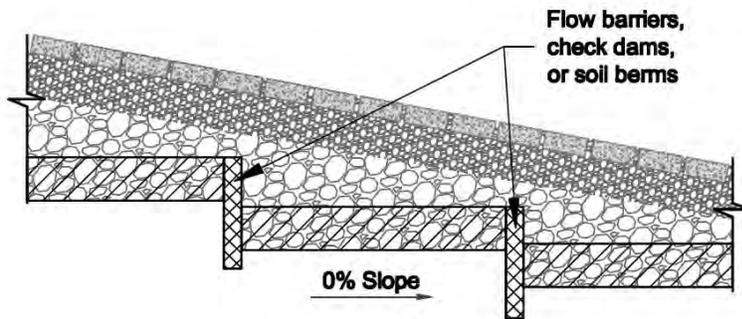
Type Profile of Permeable Pavement on Sloped Sites
